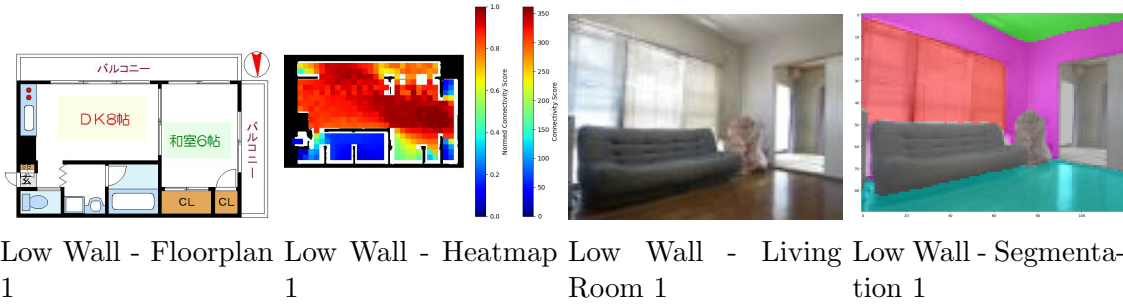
Low wall visibility property 1 - floor plan, heatmap, living room, and segmentation.
